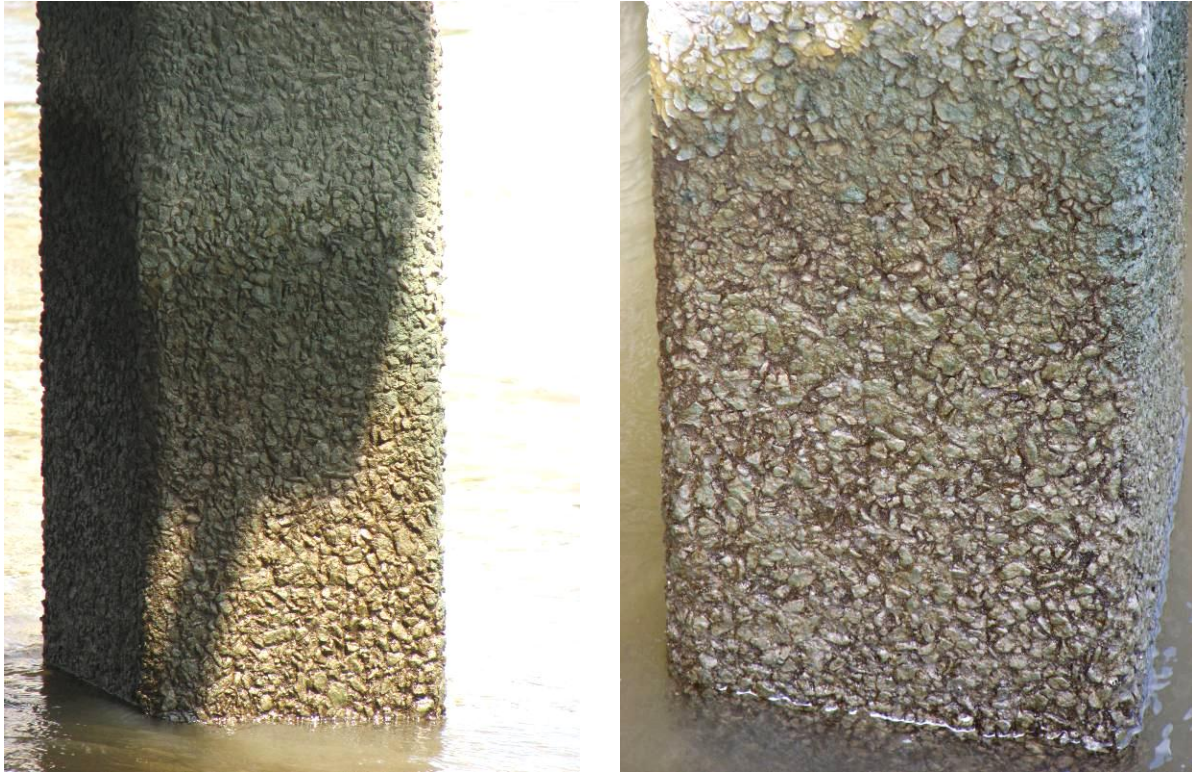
Surface Abrasion Observed in Concrete Substructure of Houlihan Bridge (Bridge No. 051-0054)
